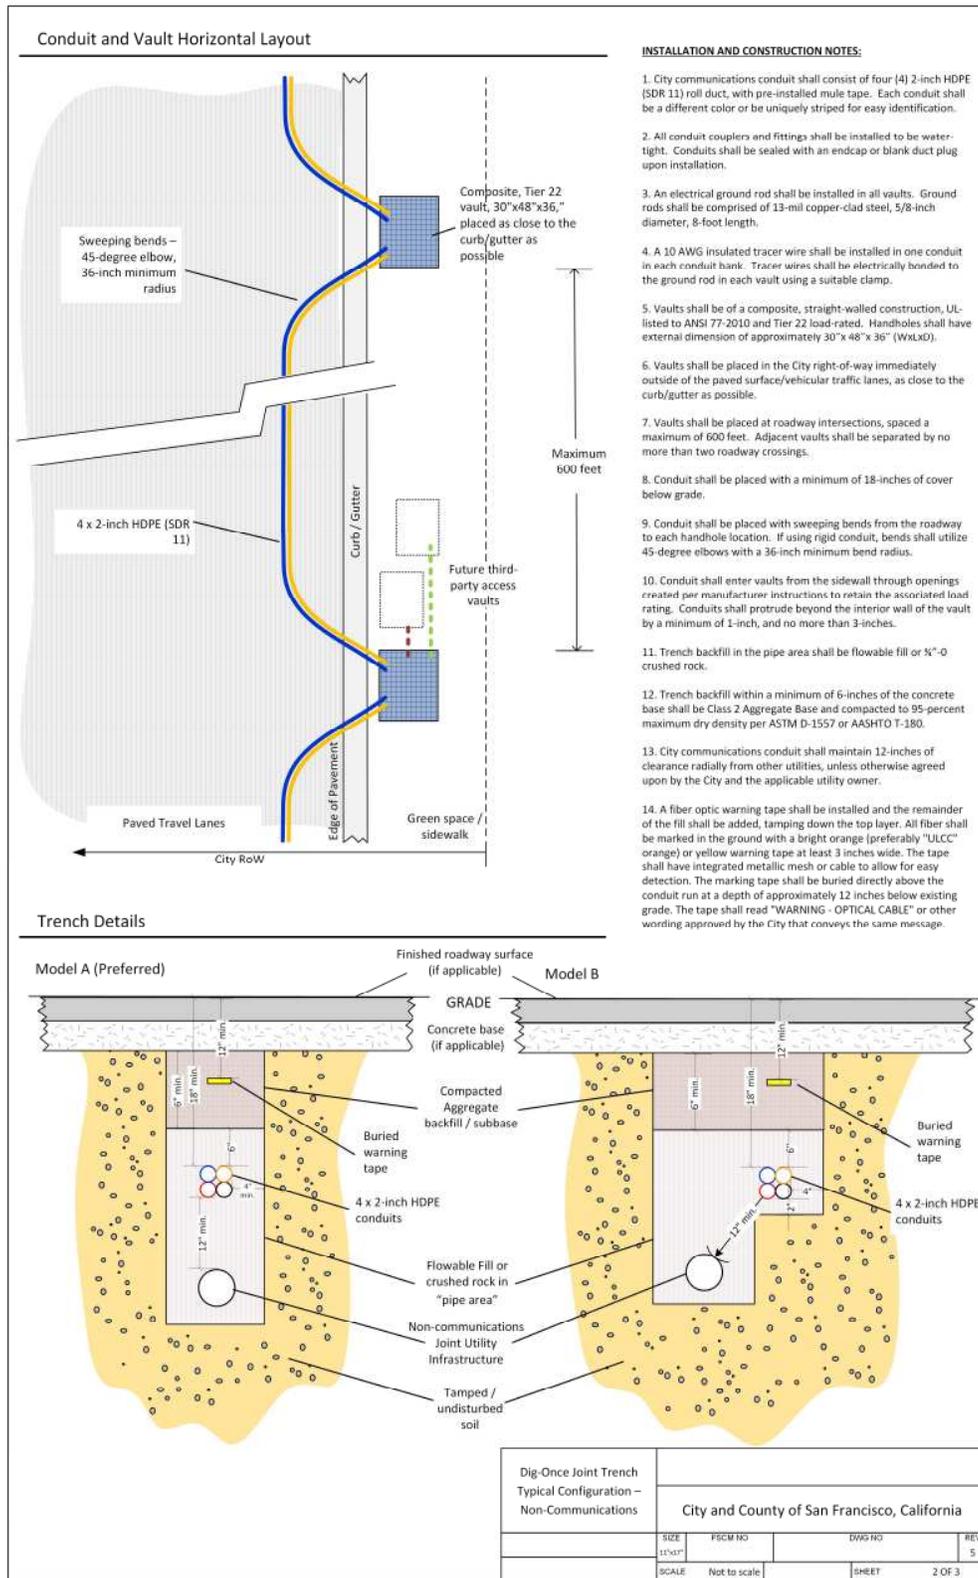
TYPICAL CONFIGURATION FOR CONDUIT IN SHARED TRENCH
